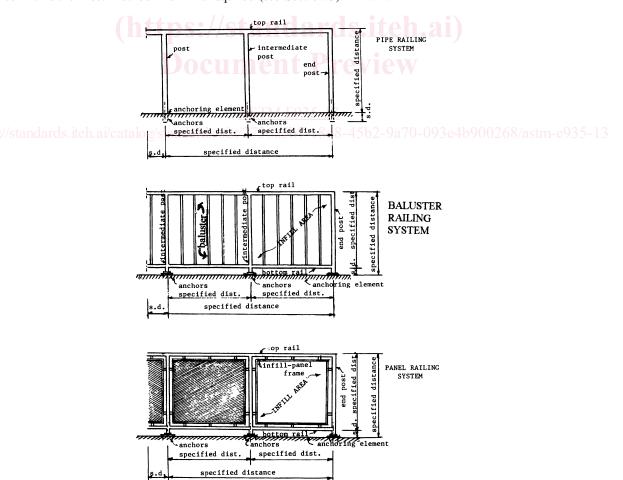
Front Views of Sections of Three Typical Railing Systems
